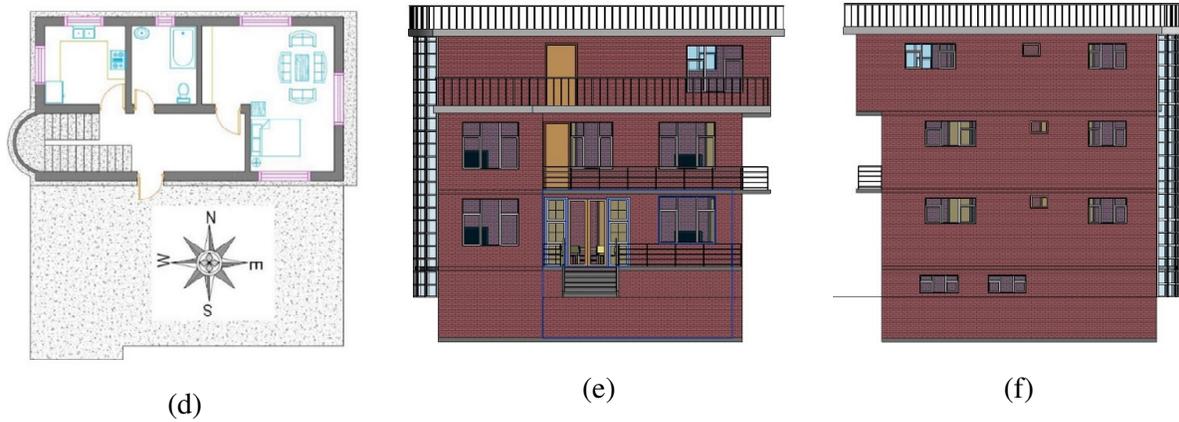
Plan and Elevation of the case study building (d) Terrace floor plan (e), (f) Front (south facing) & back elevation
